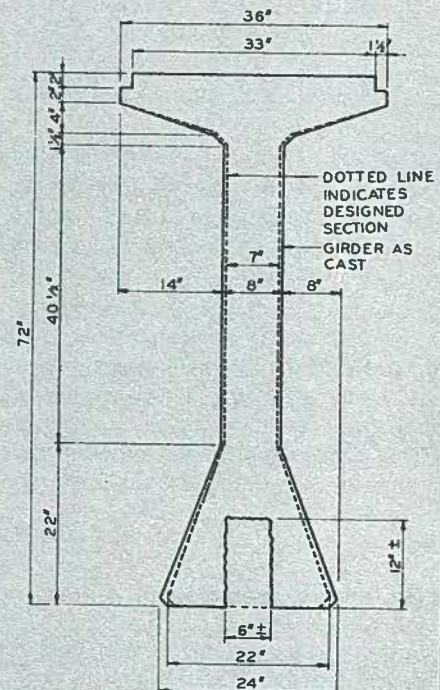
Cross section of oversized girder with tendons not completely surrounded by concrete.
